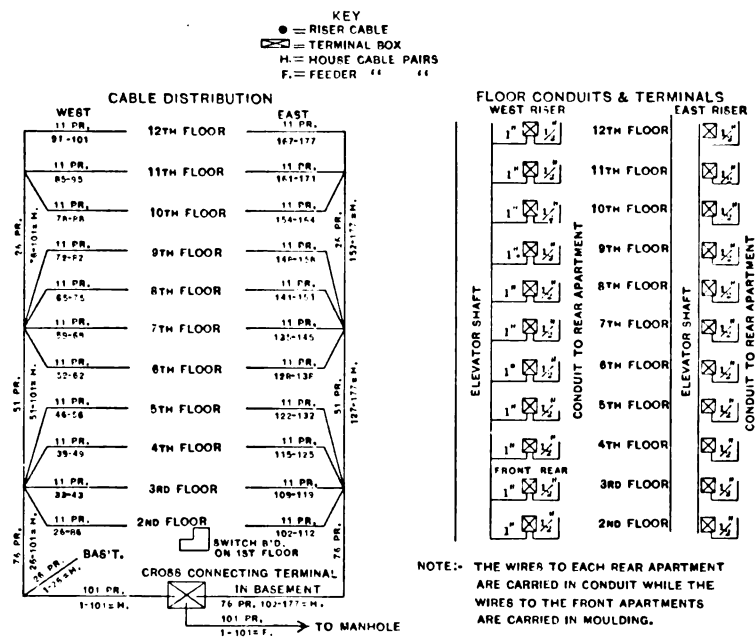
12-STORY ELEVATOR APARTMENT HOUSE.
